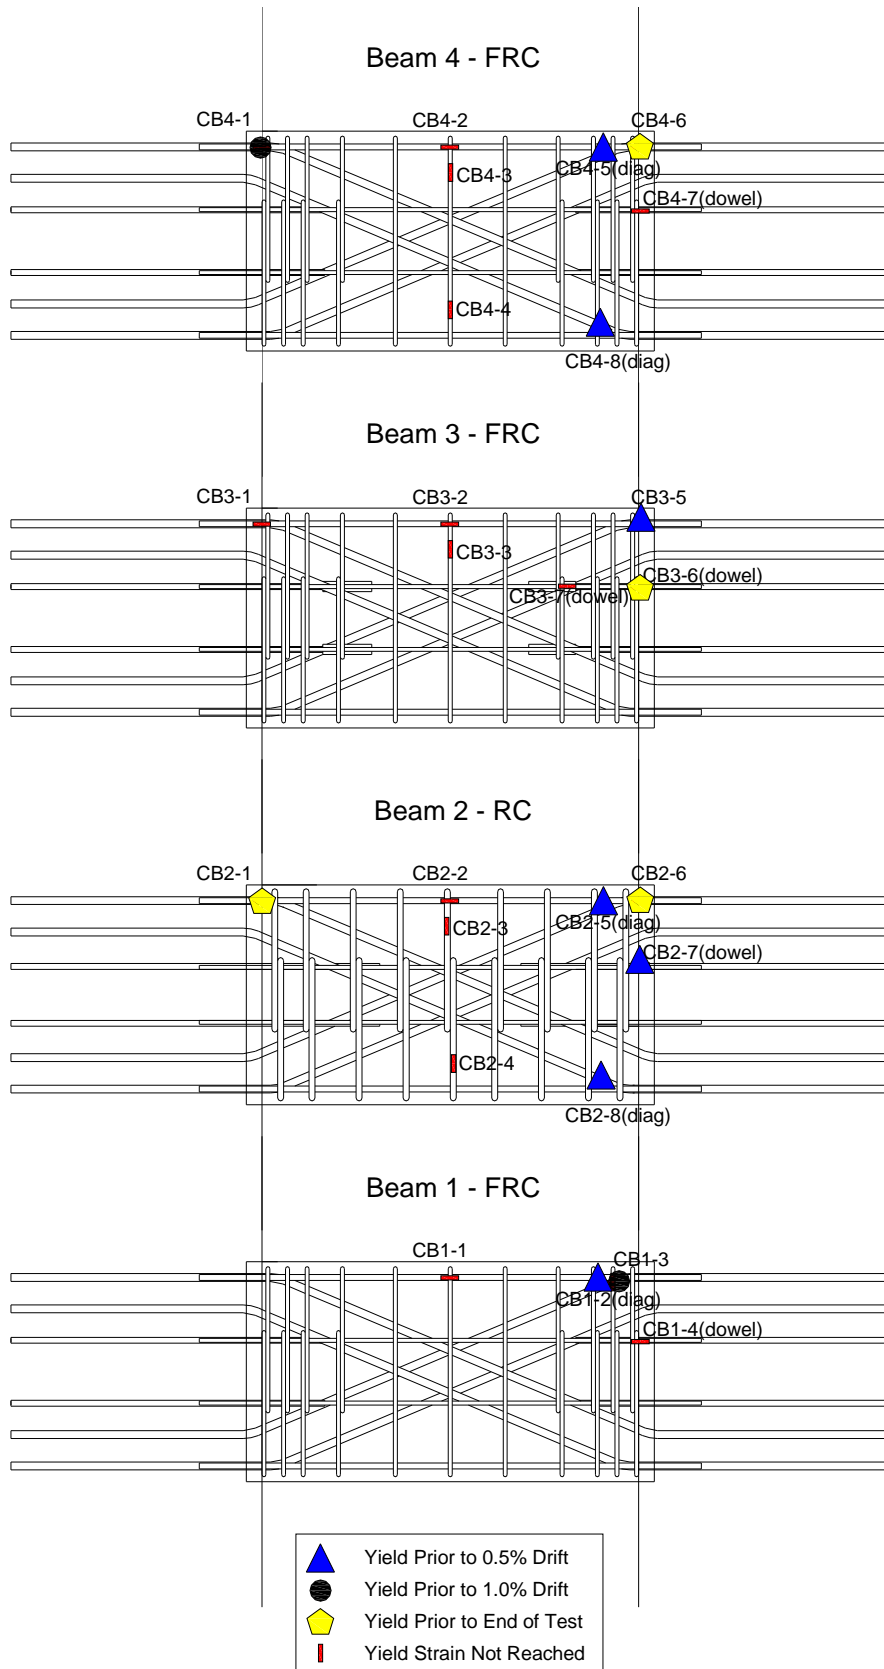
Progression of yielding at strain gauge locations (Specimen CW-1, beams)
